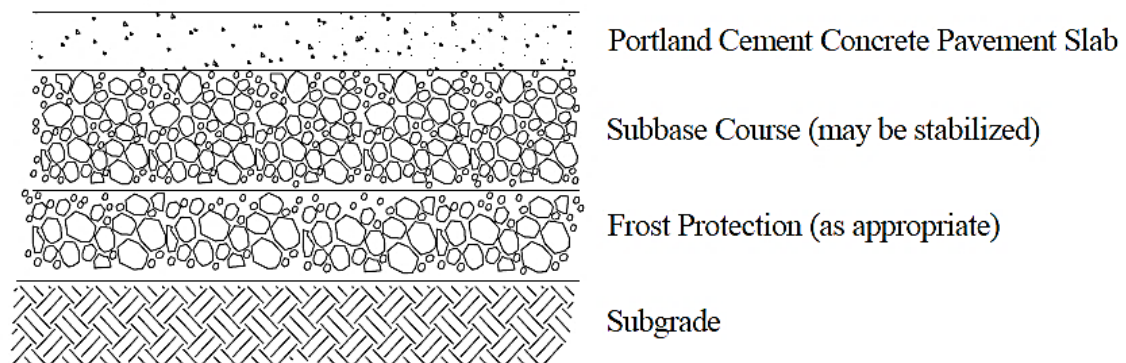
TYPICAL RIGID PAVEMENT STRUCTURE (FAA, 2007 B)
